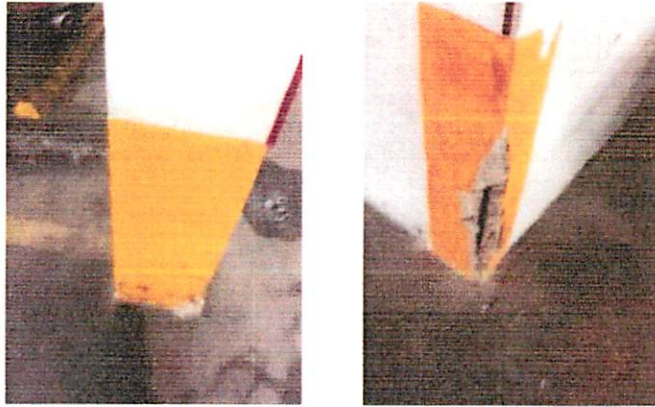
Typical cracking and spalling at parking garage columns
